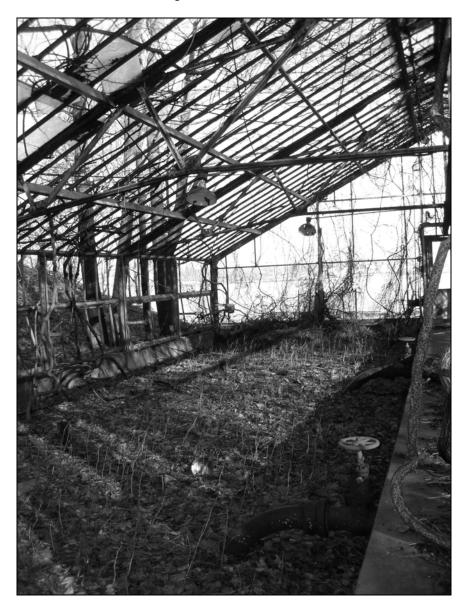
Northern and eastern façades with view of interior, facing southwest.
